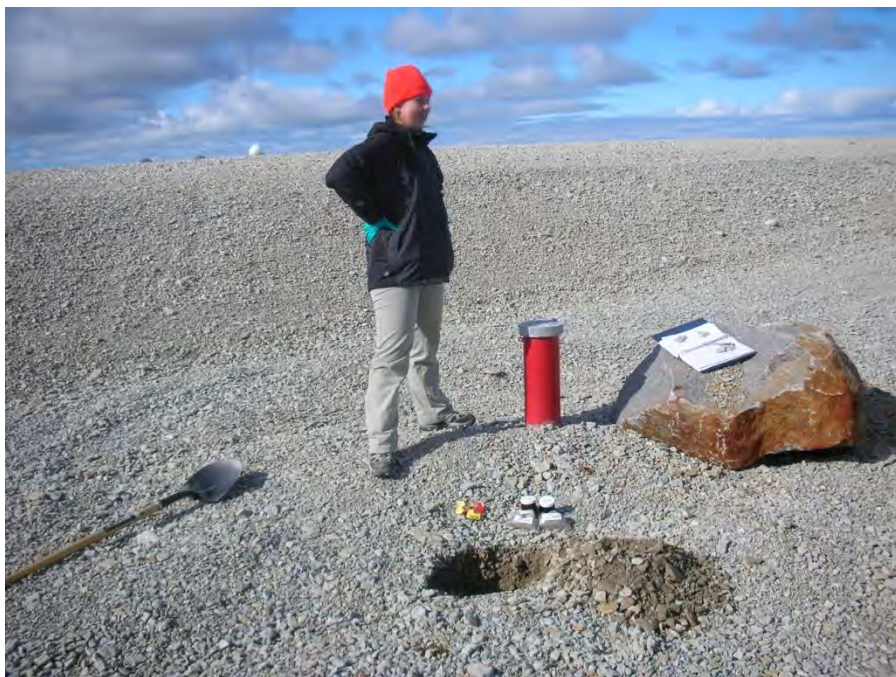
East Beach Landfill South: Gravel ridge located at centre of landfill (Photo 357)↑
